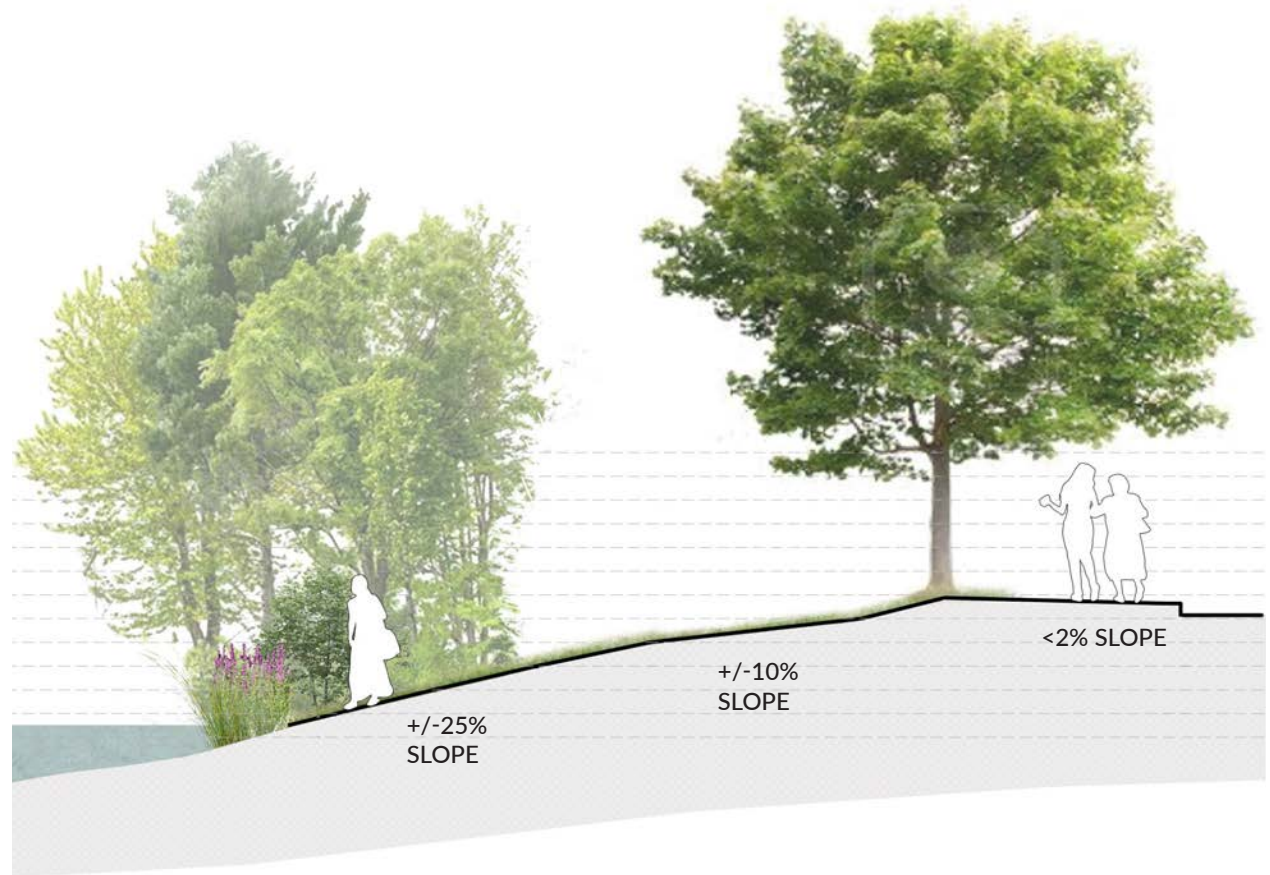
SLOPE BETWEEN LAKE SHORE ROAD AND THE POND EDGE
